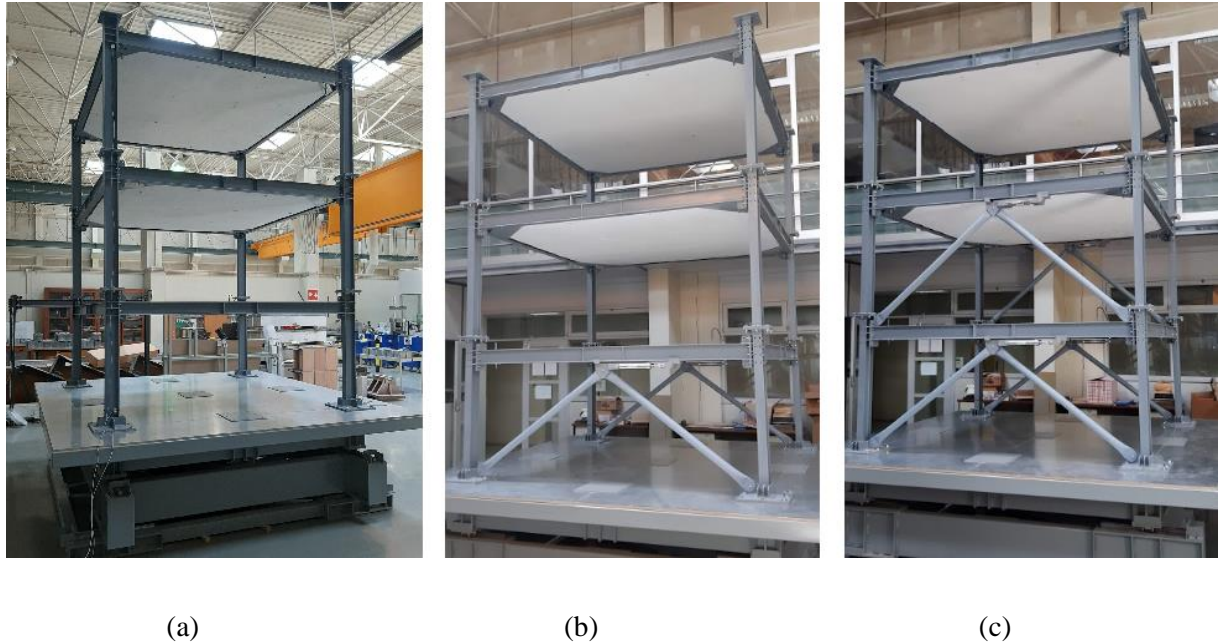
Structural framed. (a) Without extra damping; (b) With extra damping on 1st floor; (c) With extra damping on 1st and 2nd floors.
